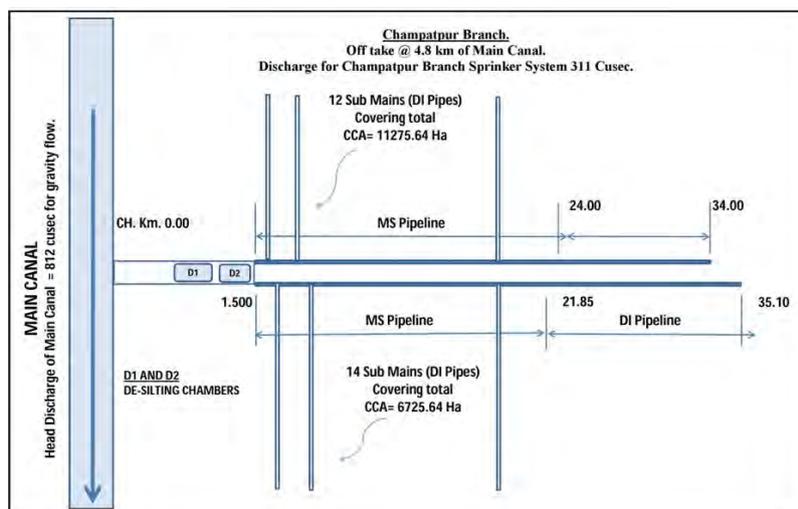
Layout plan of the pipeline of Aonla Sprinkler Irrigation System.
